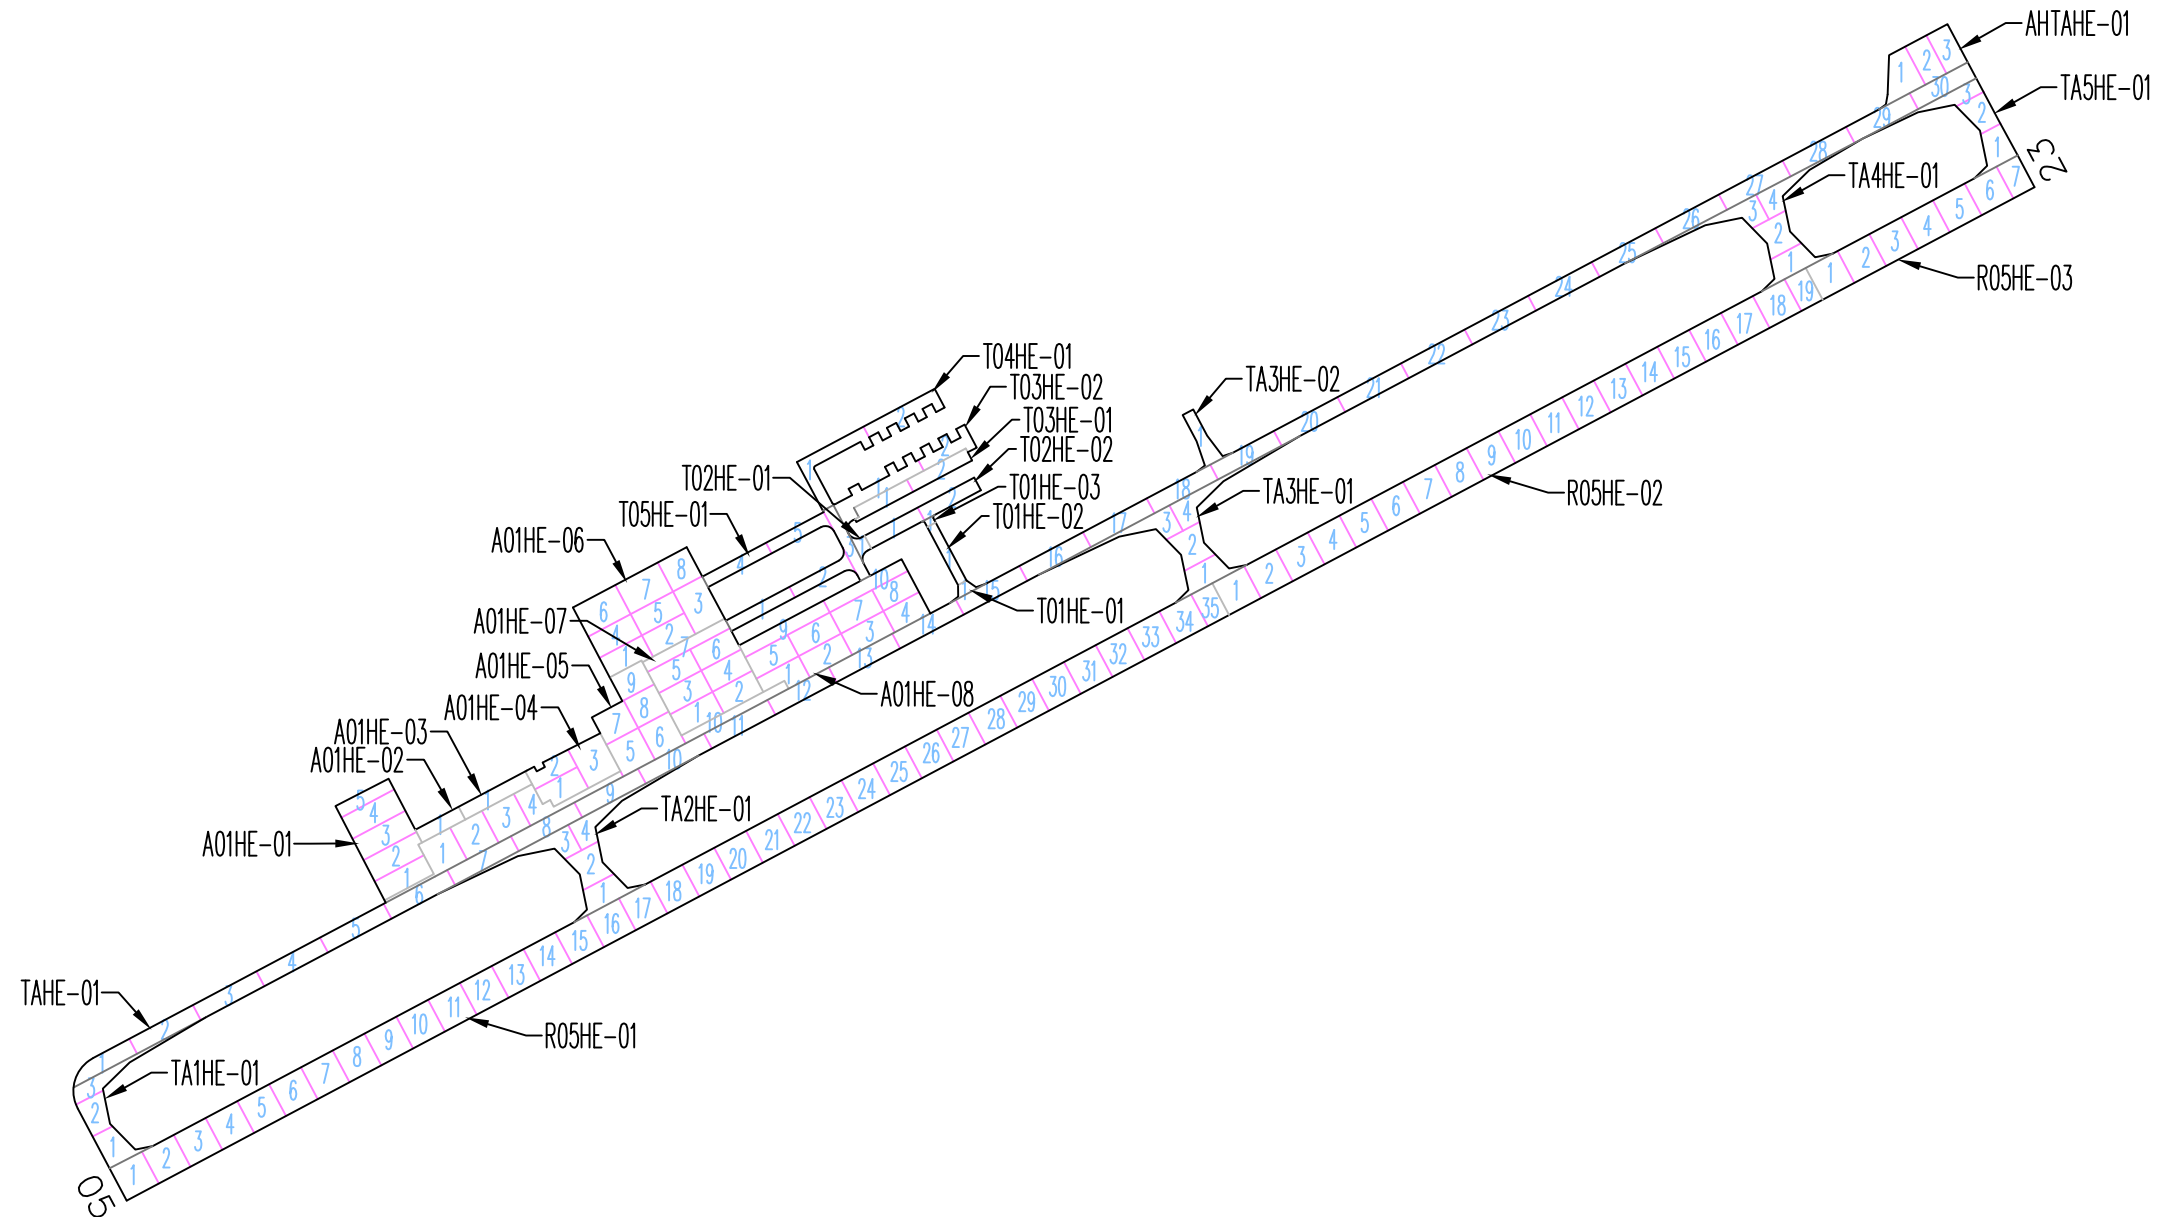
Pavement Branch, Section and Sample Unit Layout.
